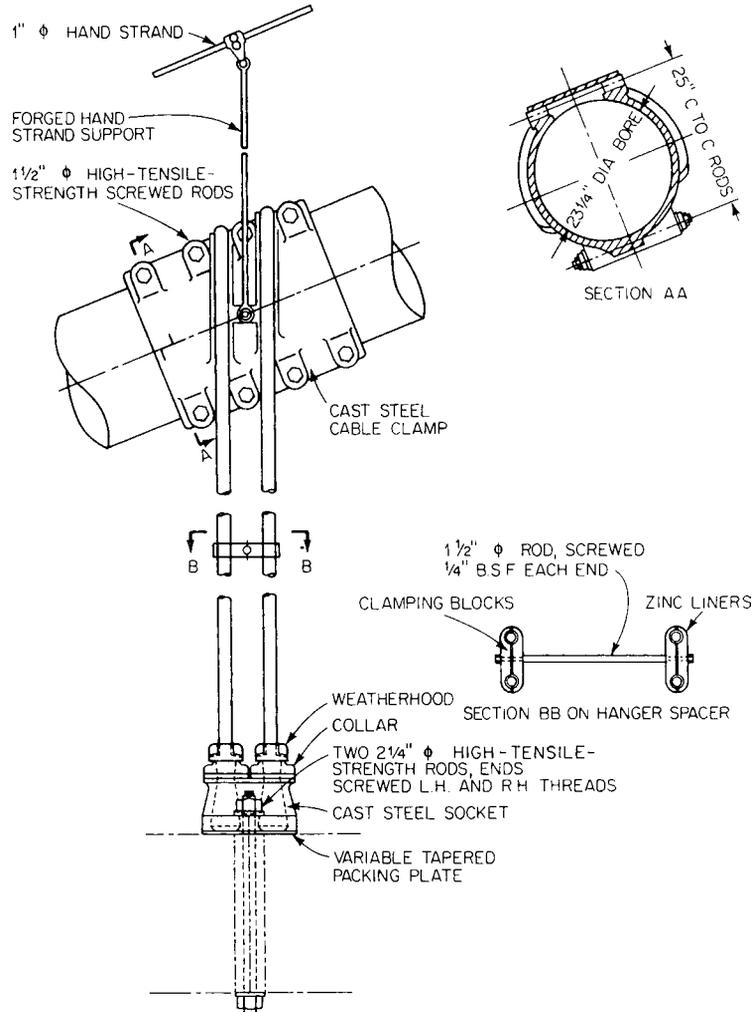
Cable band and suspender detail used for the Forth Road Bridge. (Reprinted with permission from Sir Gilbert Roberts, "Forth Road Bridge," Institution of Civil Engineers, London.)
